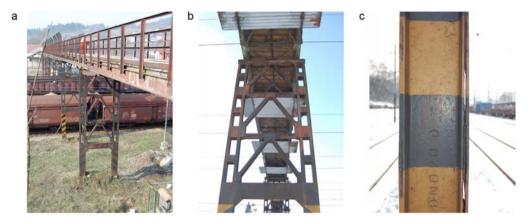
(a) overall view of the footbridge #1; (b) bottom view; (c) crevice corrosion of the pier columns.
